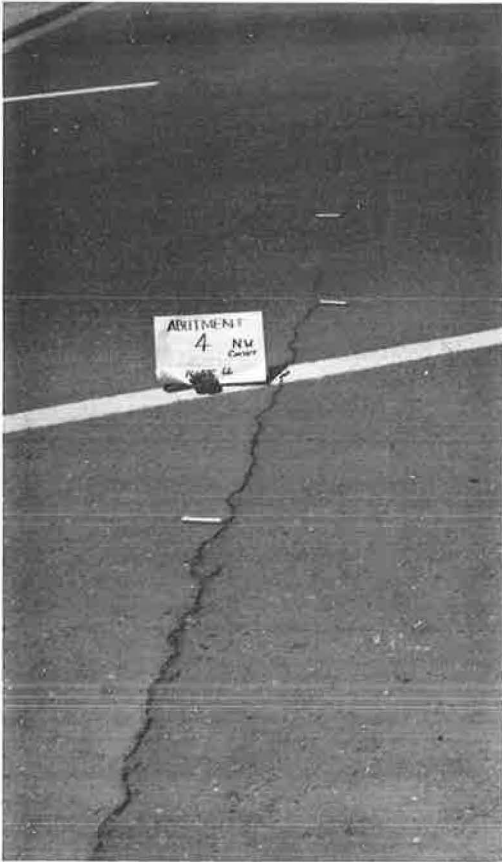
Typical crack in pavement next to bridge abutments.
